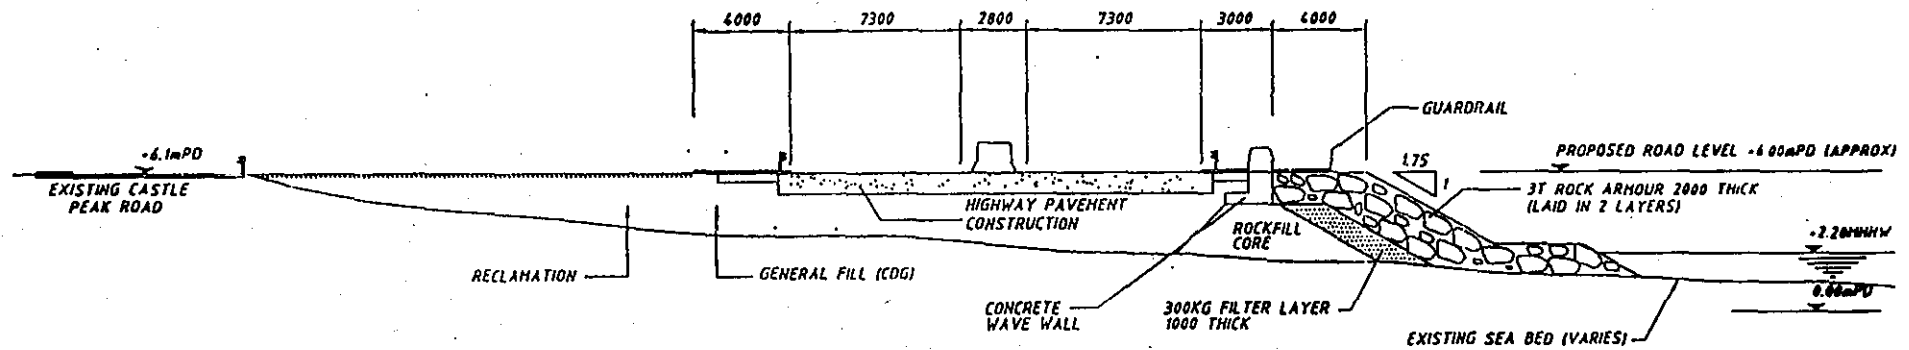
Cross Section of Reclamation at Tsing Lung Tau
